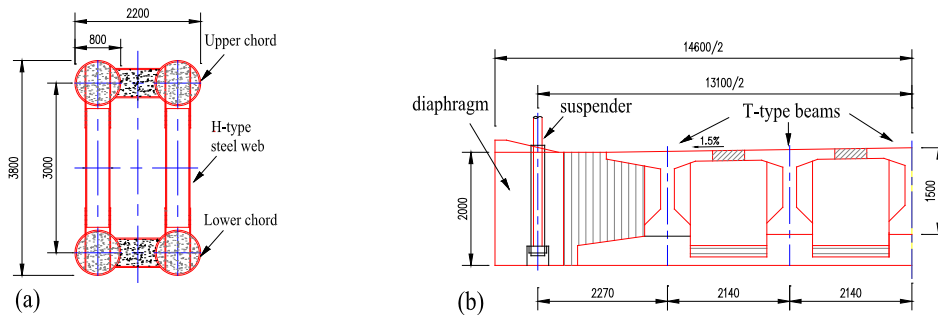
Cross sections of main bridge components (a) arch rib, (b) deck system (not to scale, unit: mm)
